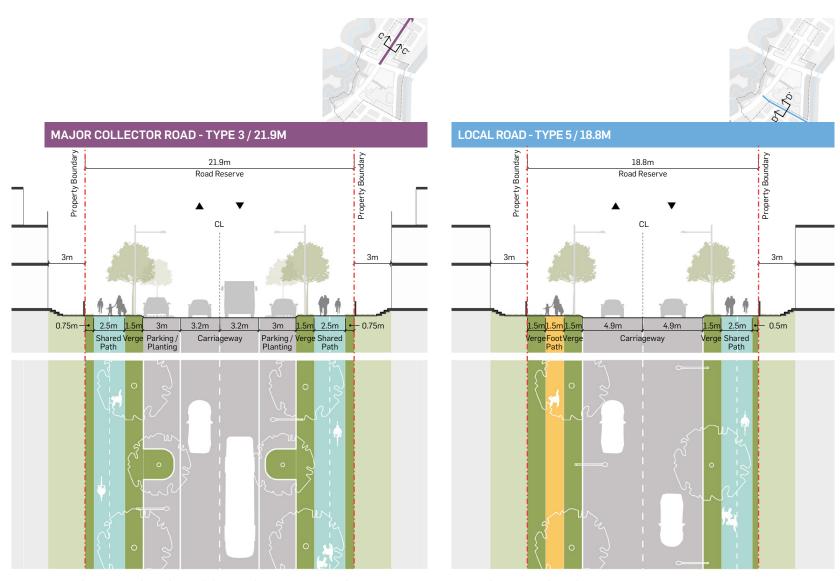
Indicative Street Section C-C' - Major Collector Road - Type 3
